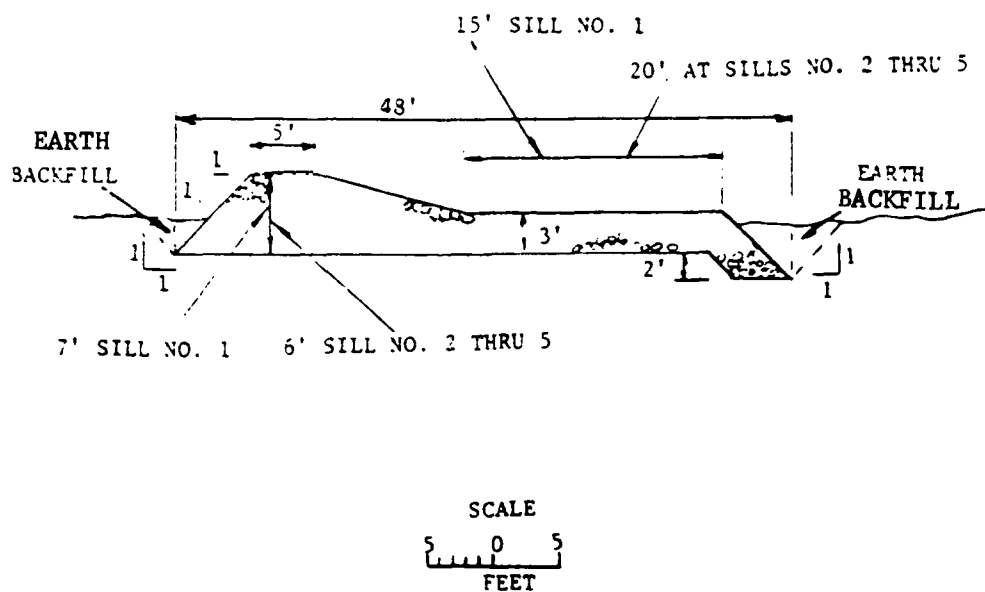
West Fork Ditch at Onawa, Iowa. Cross-sectional view (through structure center line) of low-rock sills
